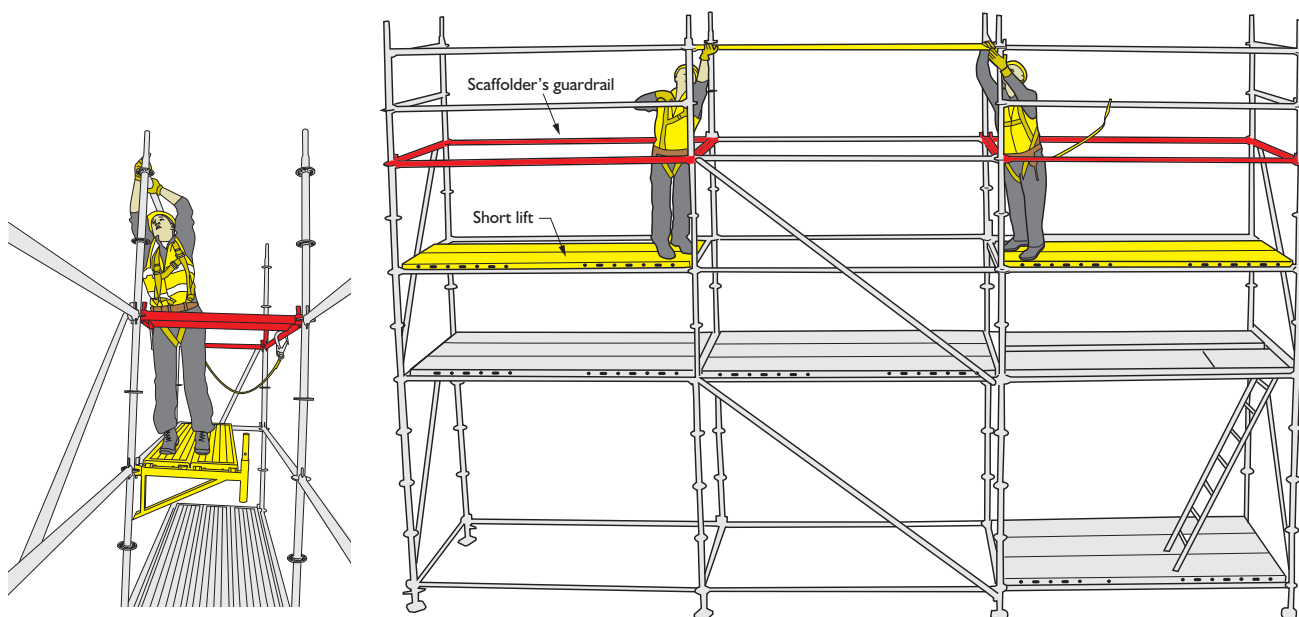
System scaffold side brackets used to create a scaffolders' step platform in alternate bays. The middle bays can be reached from adjacent bays to fix the guardrails.
